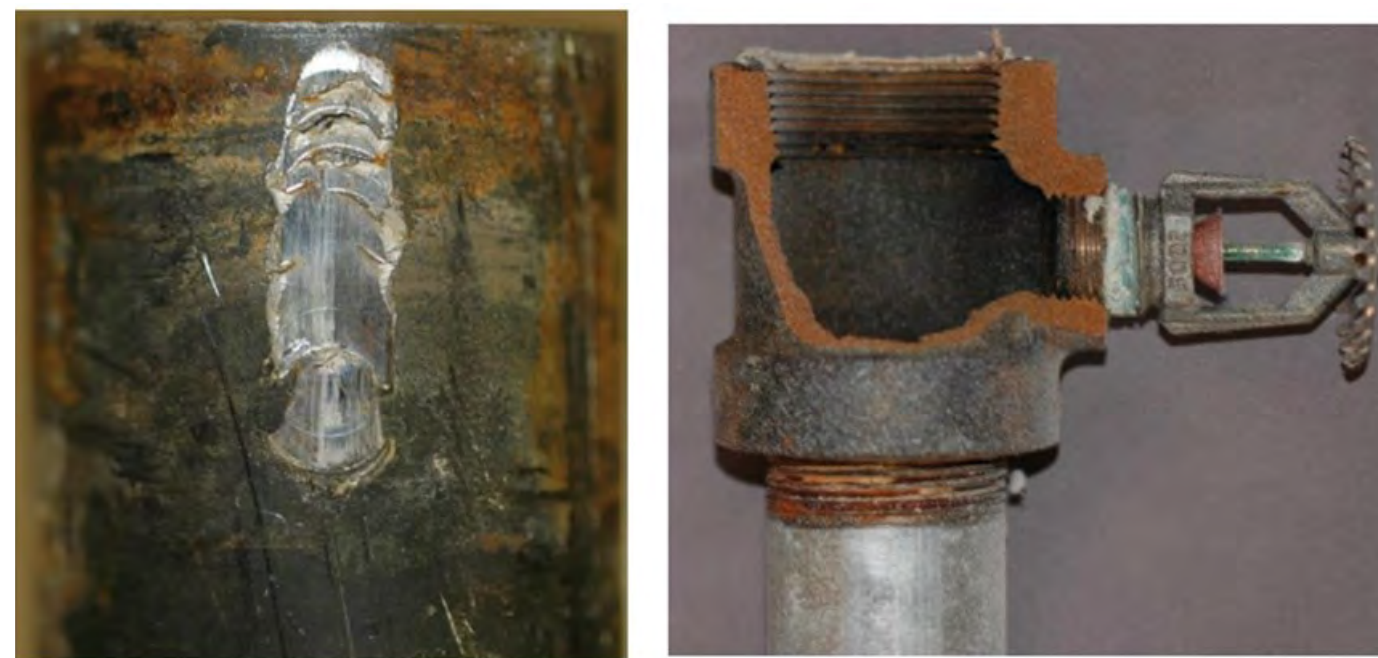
Freeze-up failure. Source: Crane Engineering 2014
